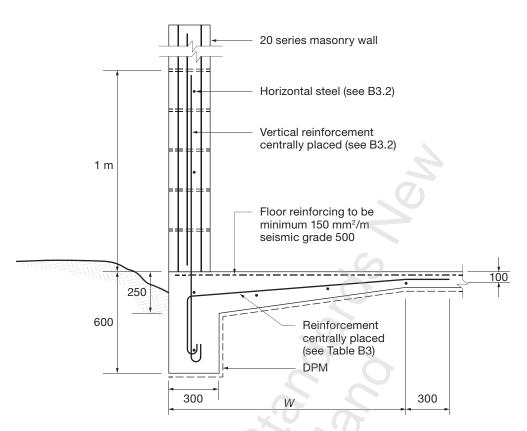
Strip footing consisting of floor slab on one side of a cantilevered wall (For use in conjunction with Table B4 – see B4.1.1(c))
